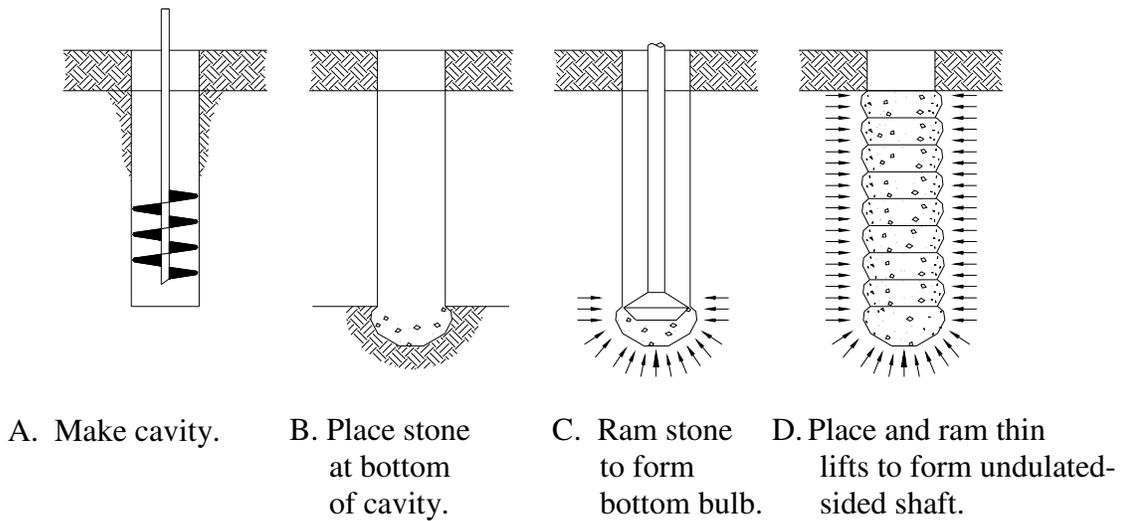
Rammed Aggregate Pier Reinforcement Installation Procedure (Fox, N.S. and Cowell, M.J. (1998))
